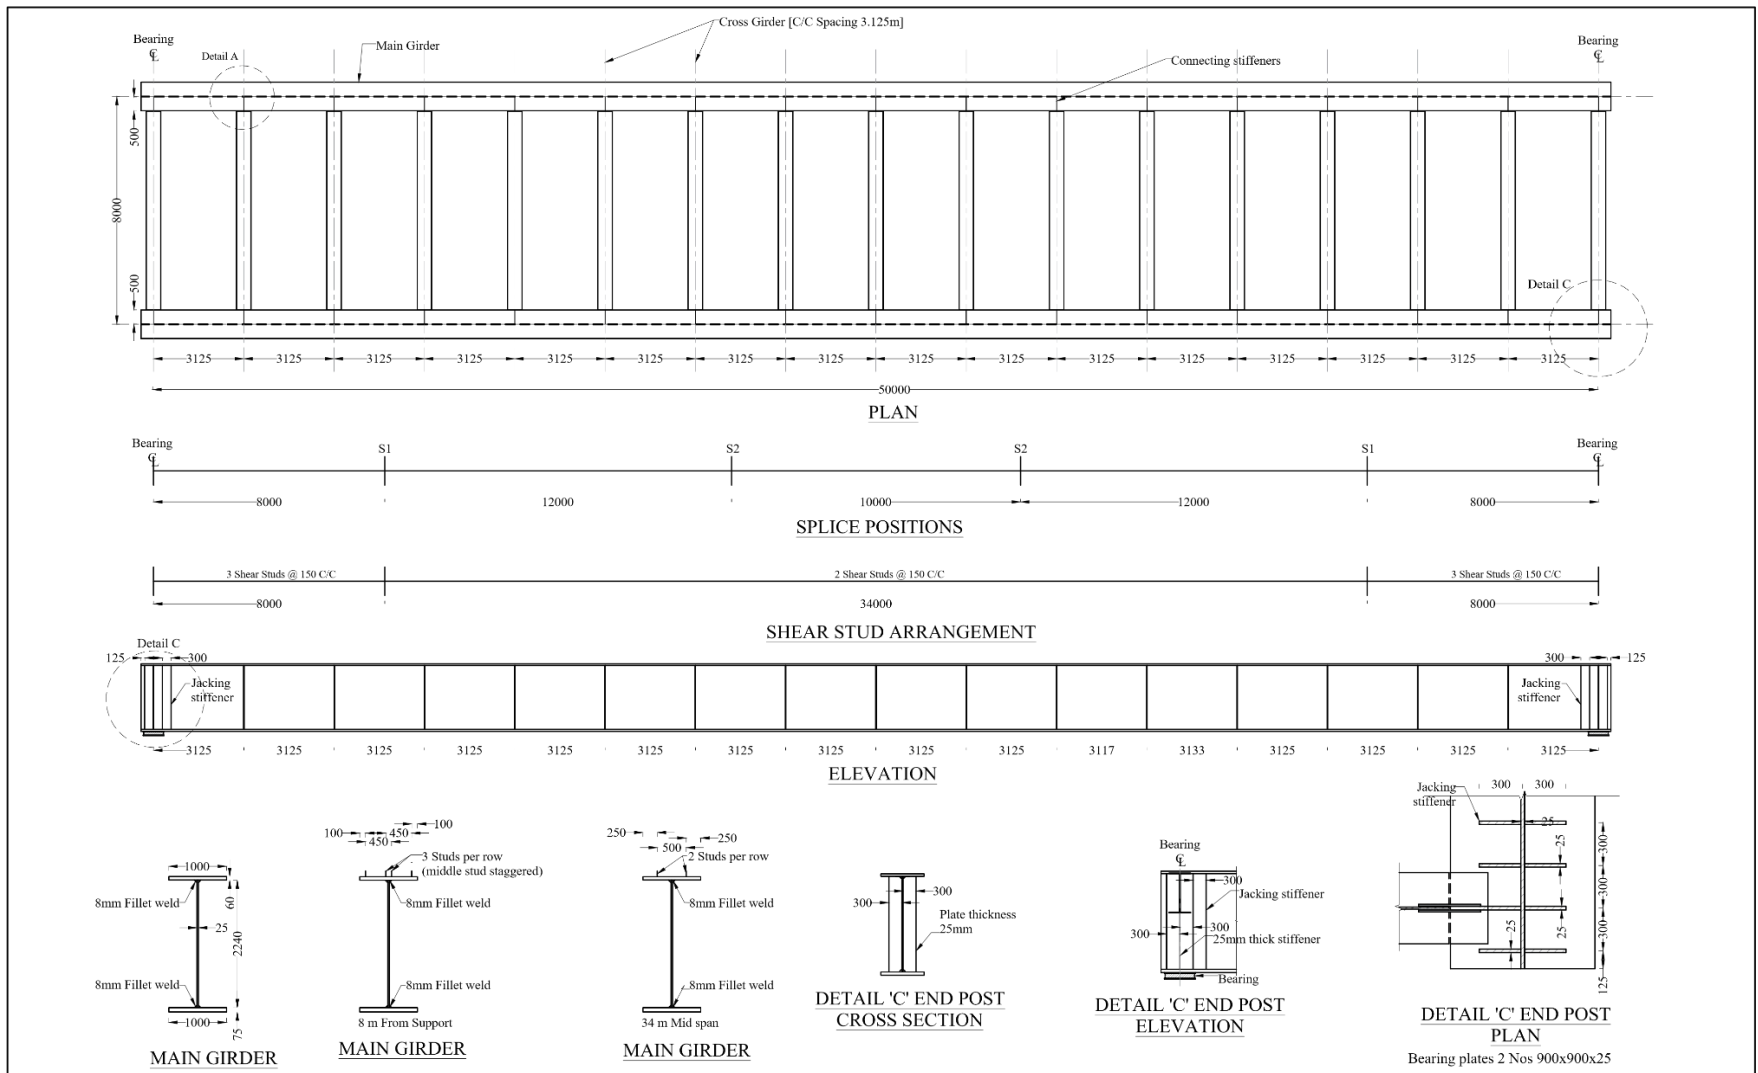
STEEL CONCRETE COMPOSITE LADDER DECK SPAN 50m
